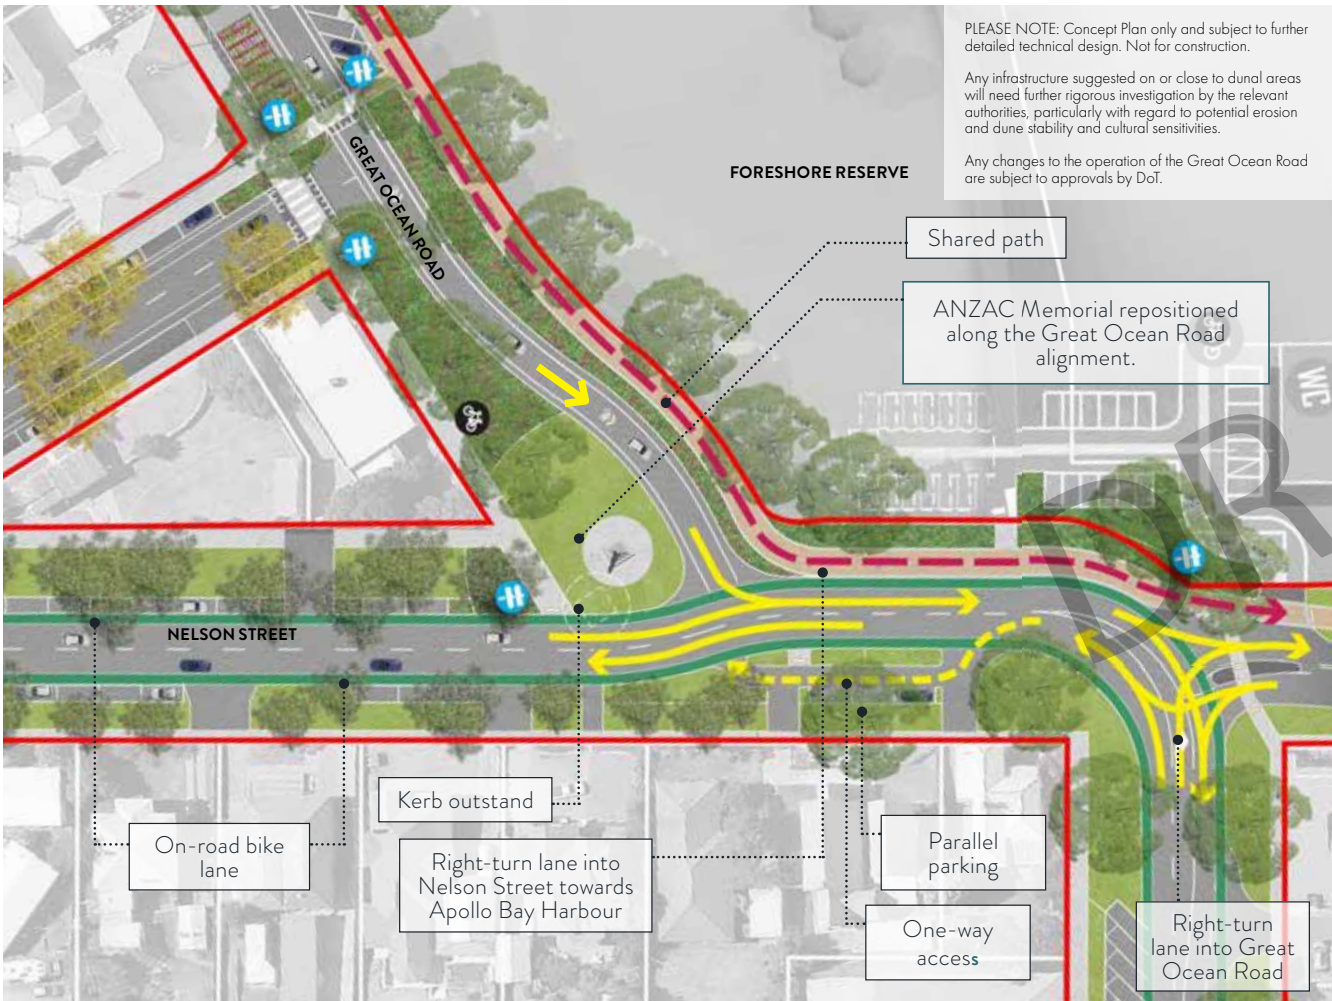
Nelson Street and Great Ocean Road Intersection - One-Way option
